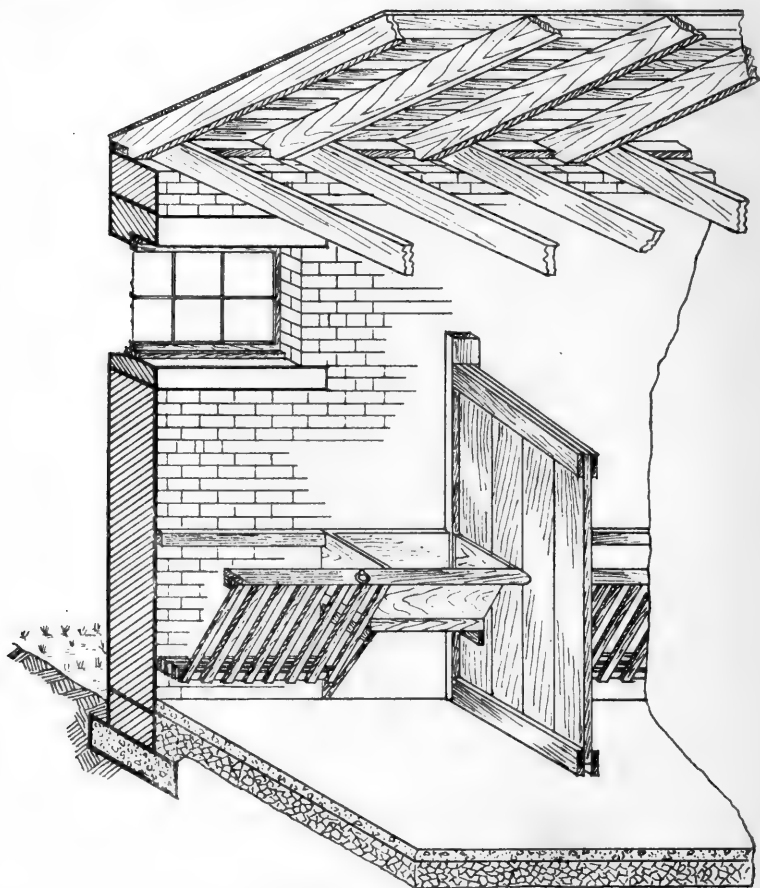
View of a horse stall commonly found in farm buildings. Bad features are the close couples which accumulate dust and retard ventilation, a fixed window with inside sill, and wood stall fittings.
